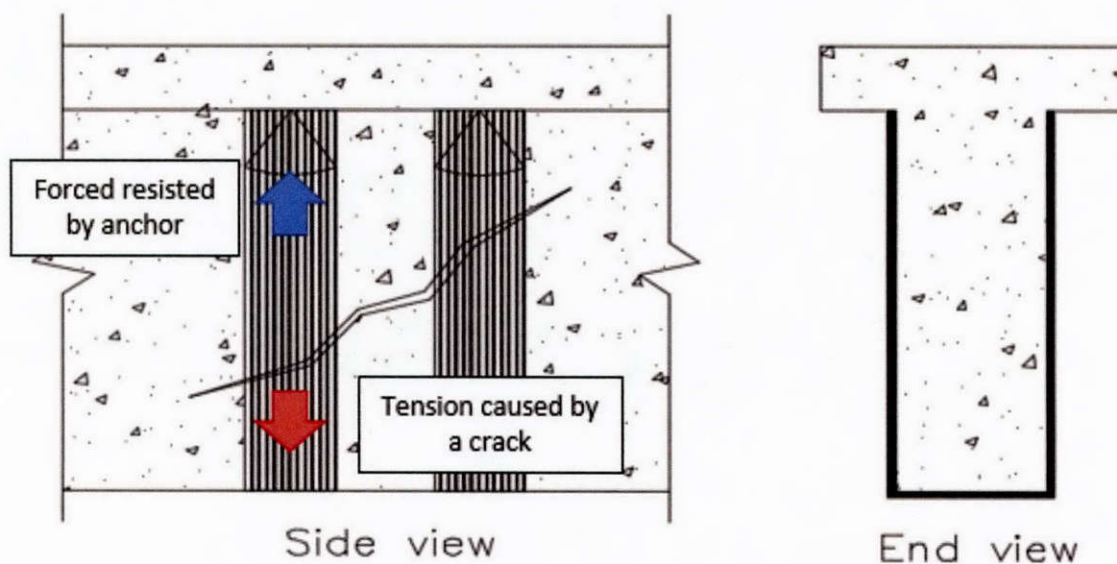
CFRP system loading in a concrete beam with inclined cracking
